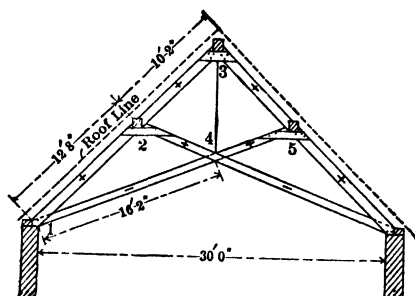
Simple Scissors Truss. Spans up to Thirty Feet
